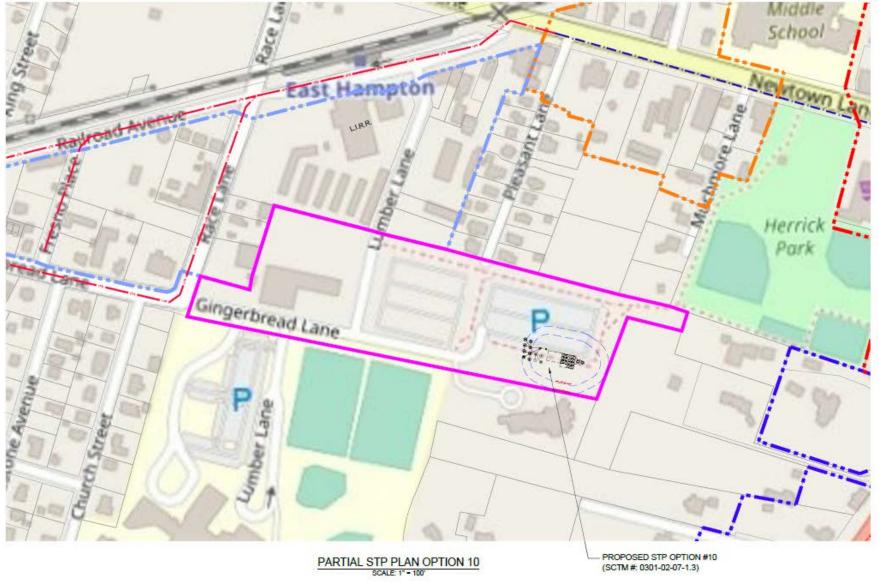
Site # 10 Location & Site Map – Lumber Lane Parking Lots in Village
